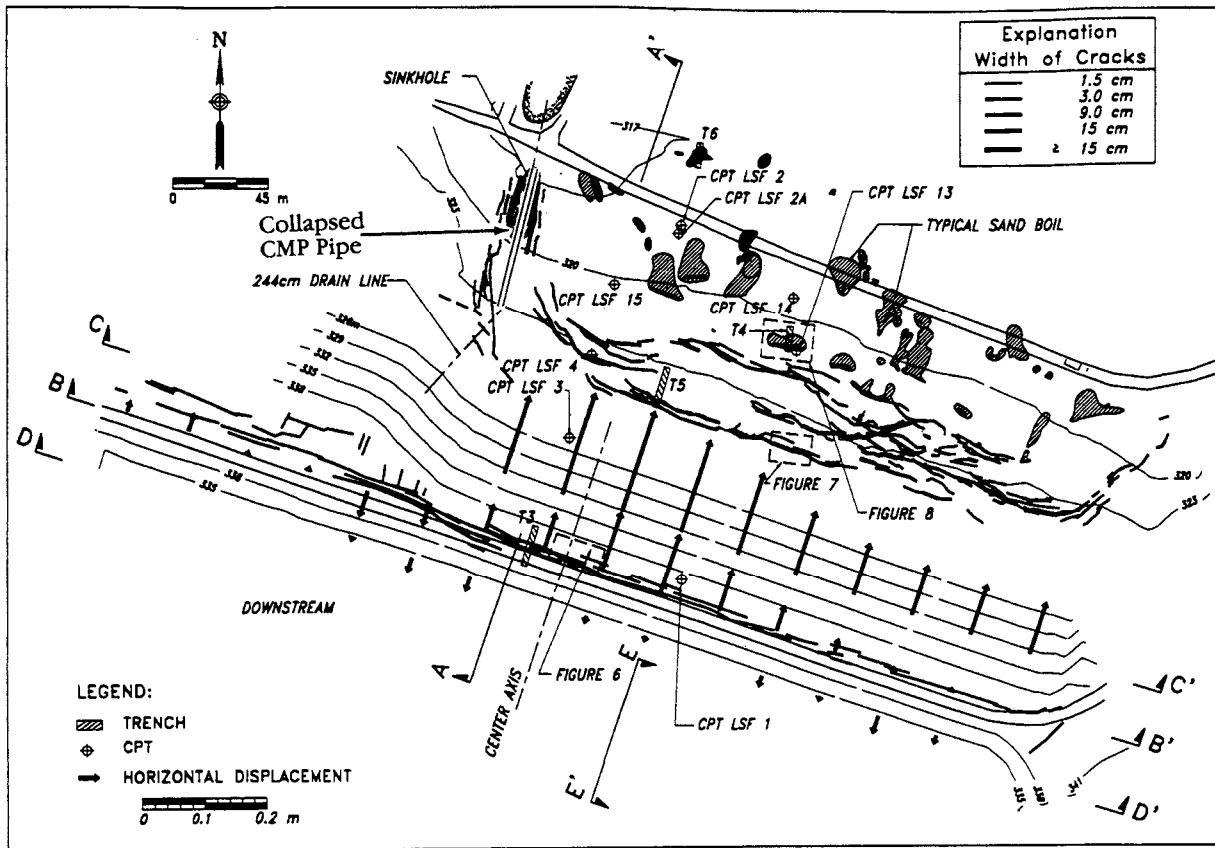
Upstream Berm at Lower San Fernando Dam Showing Alignment of Buried drain That Collapsed, and Localities of Ground Fissures and Sand Boils(After Bardet and Davis, 1995)
